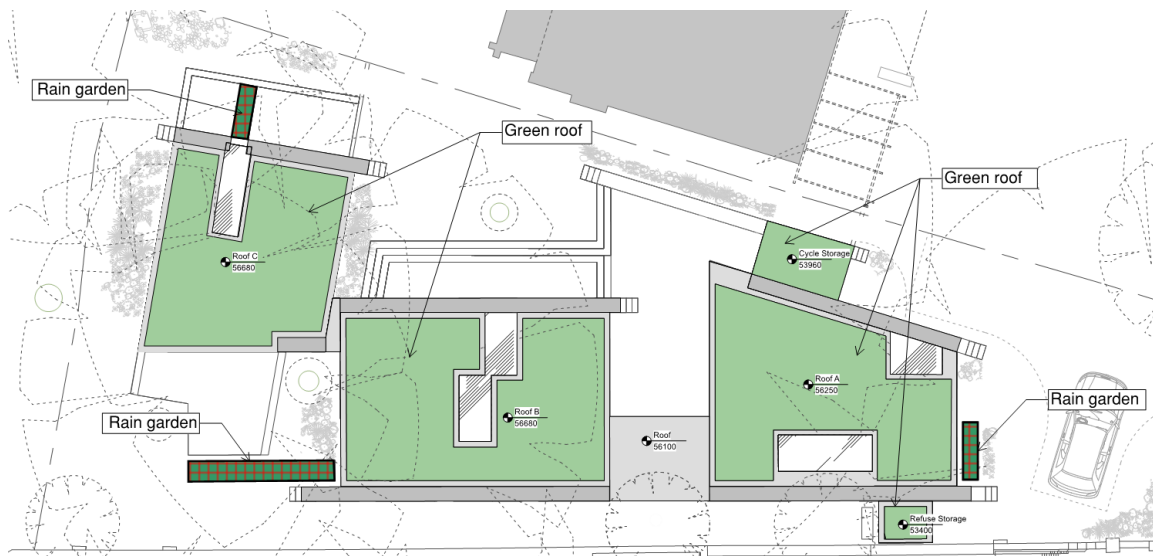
Proposed green roof extents (based on architects drawing 22002-101)
